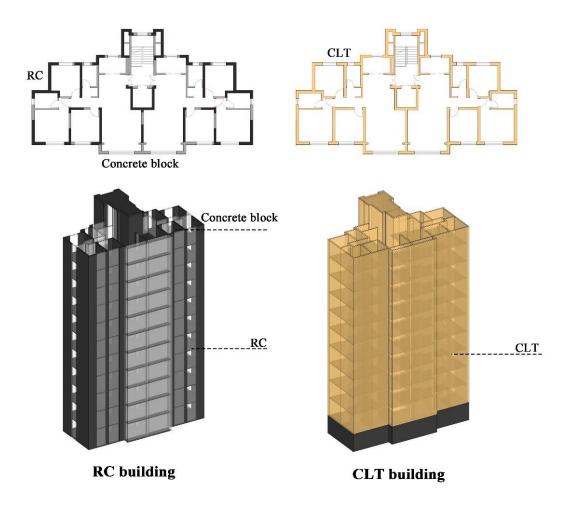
3D model and floor plan of 11-storey RC and CLT buildings
